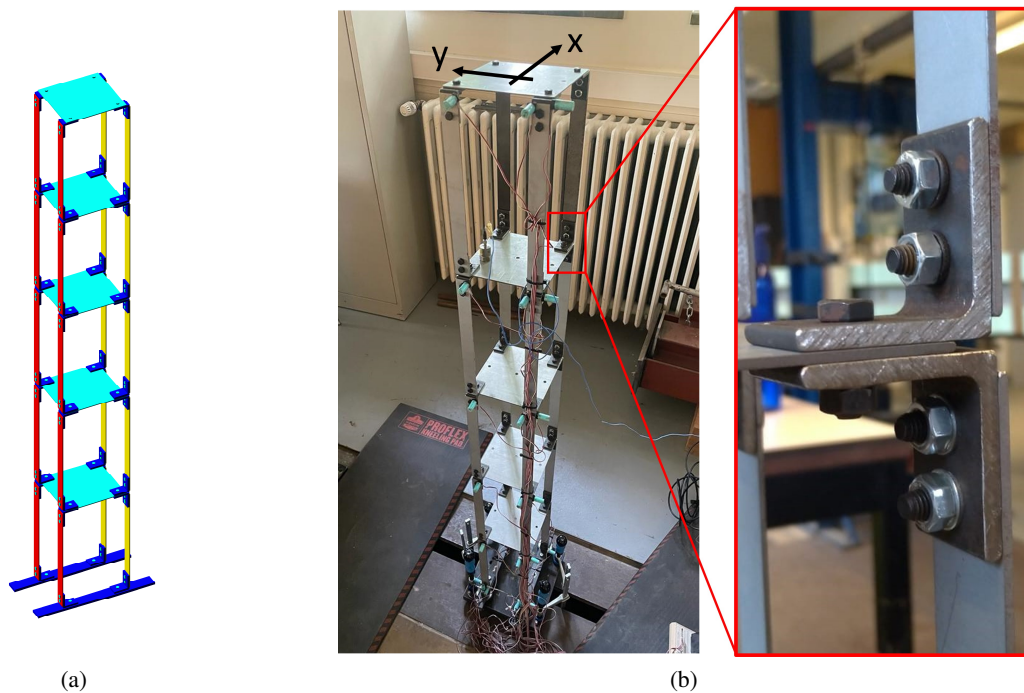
(a) AutoCAD drawing of the test structure, (b) picture of the instrumented test structure and detail of corner connectors.
